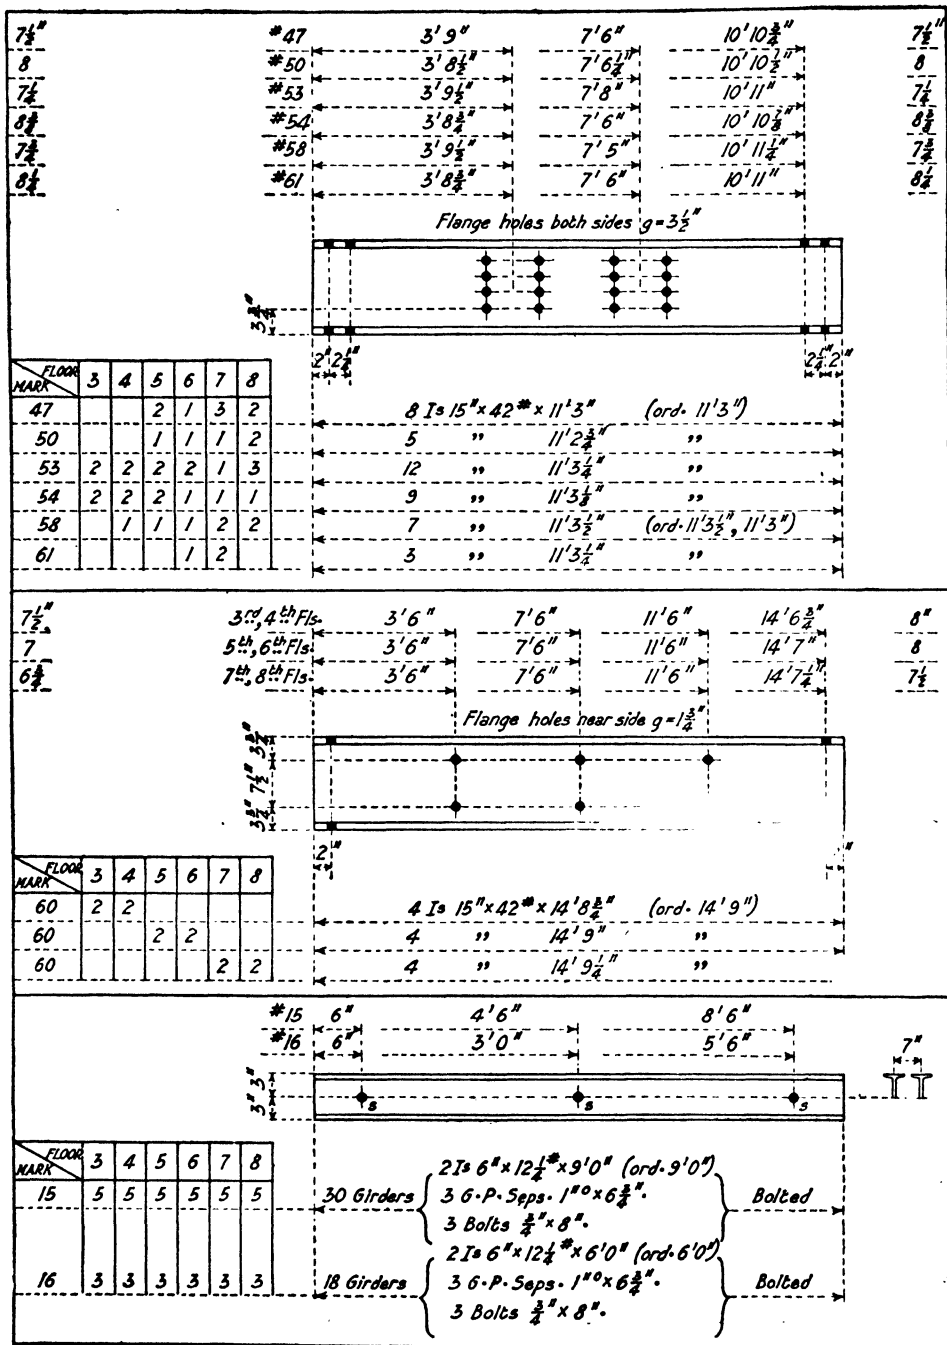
DETAILS OF FLOORBEAMS FOR A STEEL OFFICE BUILDING.
